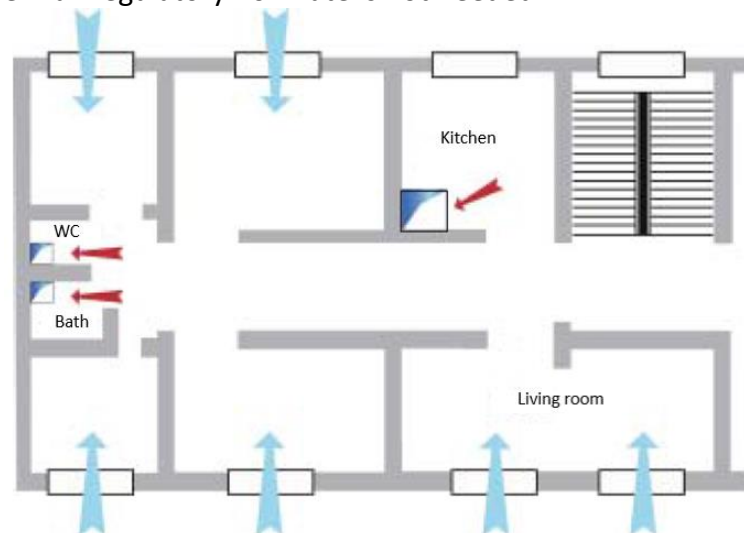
Whole building ventilation in buildings constructed since 1969 [35]
